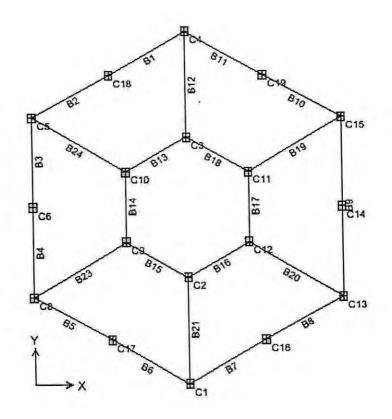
Plan of a typical cyclone shelter built by Grameen Bank
